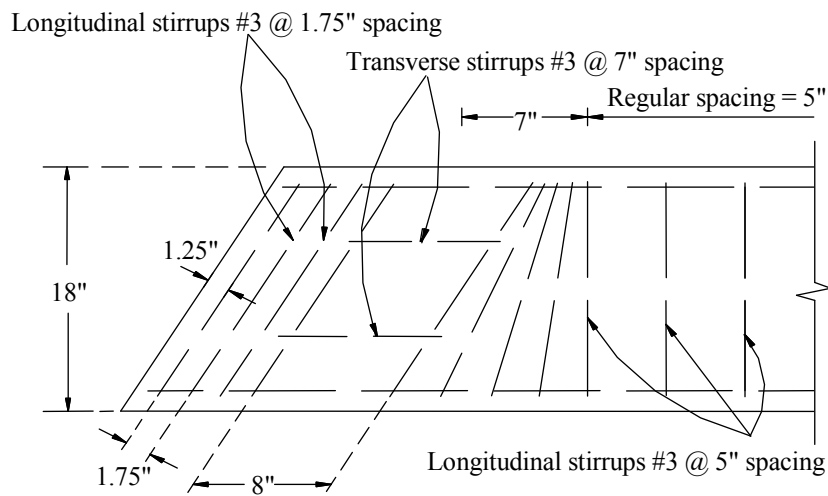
Reinforcement of interior box-beams at the end diaphragm.
